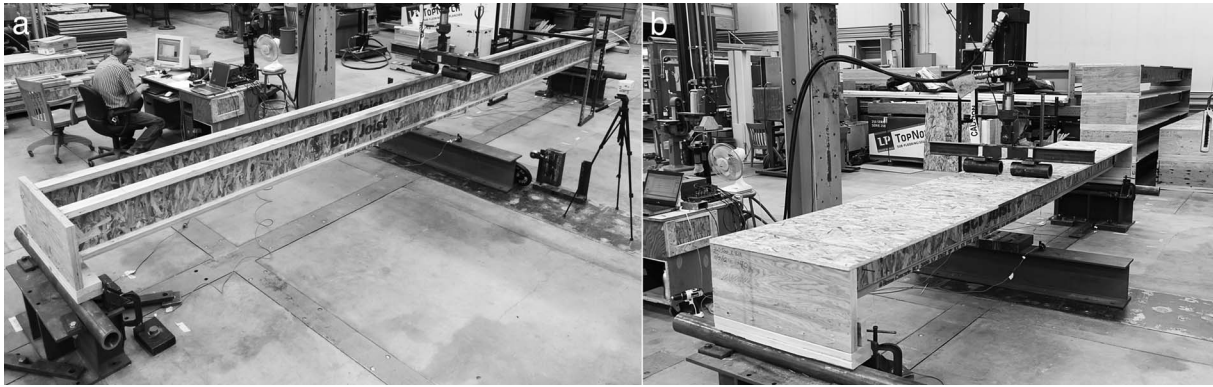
Floor specimen configurations for testing: (a) unsheathed specimen and (b) sheathed specimen.
